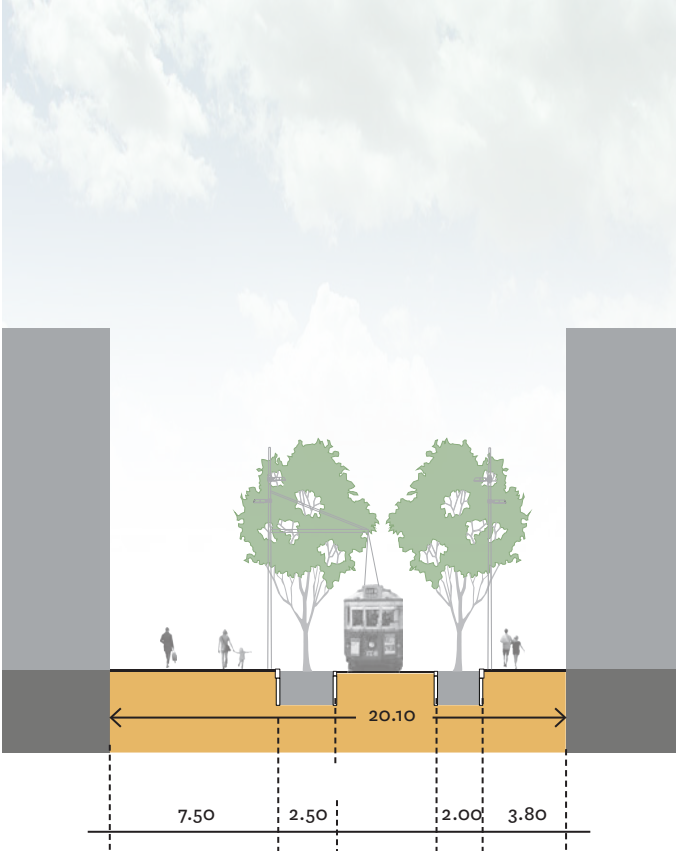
B4 – Existing cross-section of High Street north of City Mall
